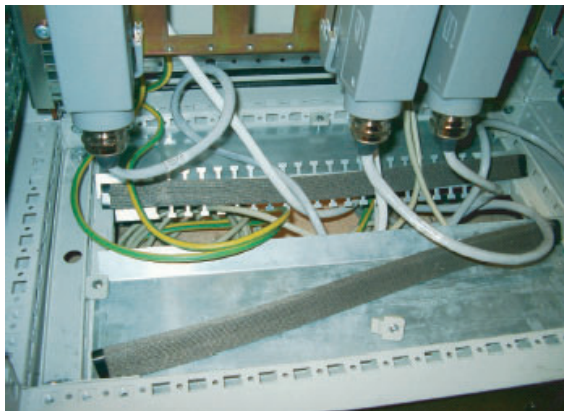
An intake of cables into an EM cupboard, where the incoming cables are not connected to the ground.
